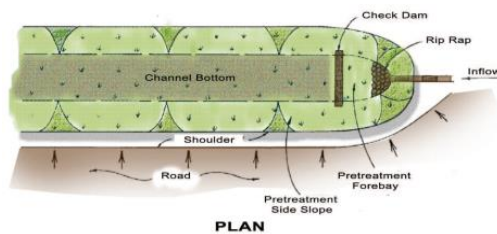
Enhanced Grass Swale Layout, Plan View (TRCA, nd)
